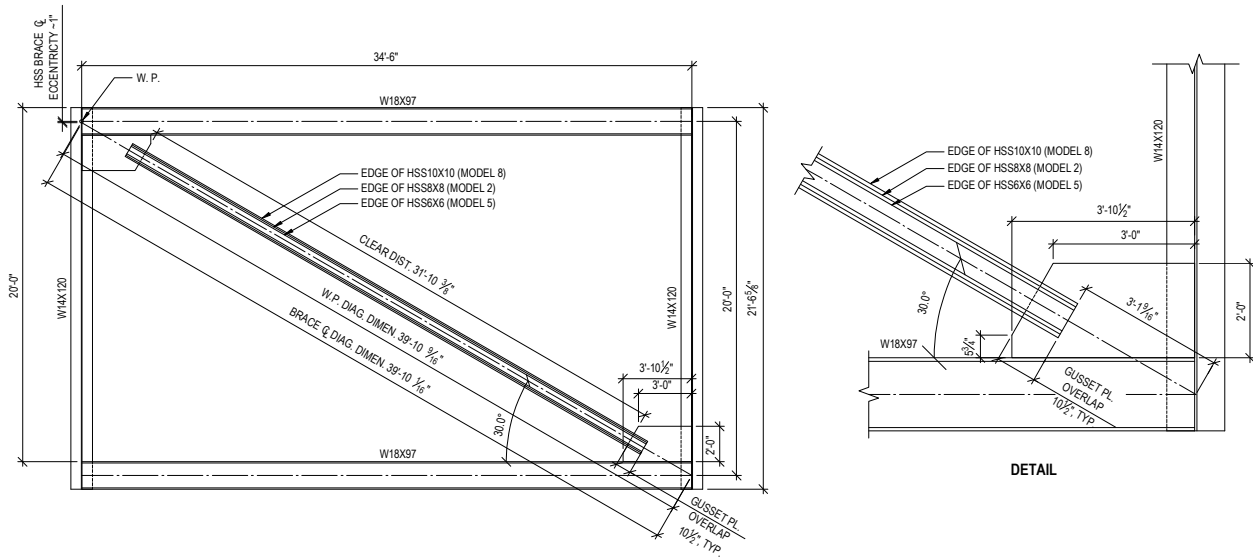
SHORT Braced Frame and Gusset Plate Detailed Geometry
